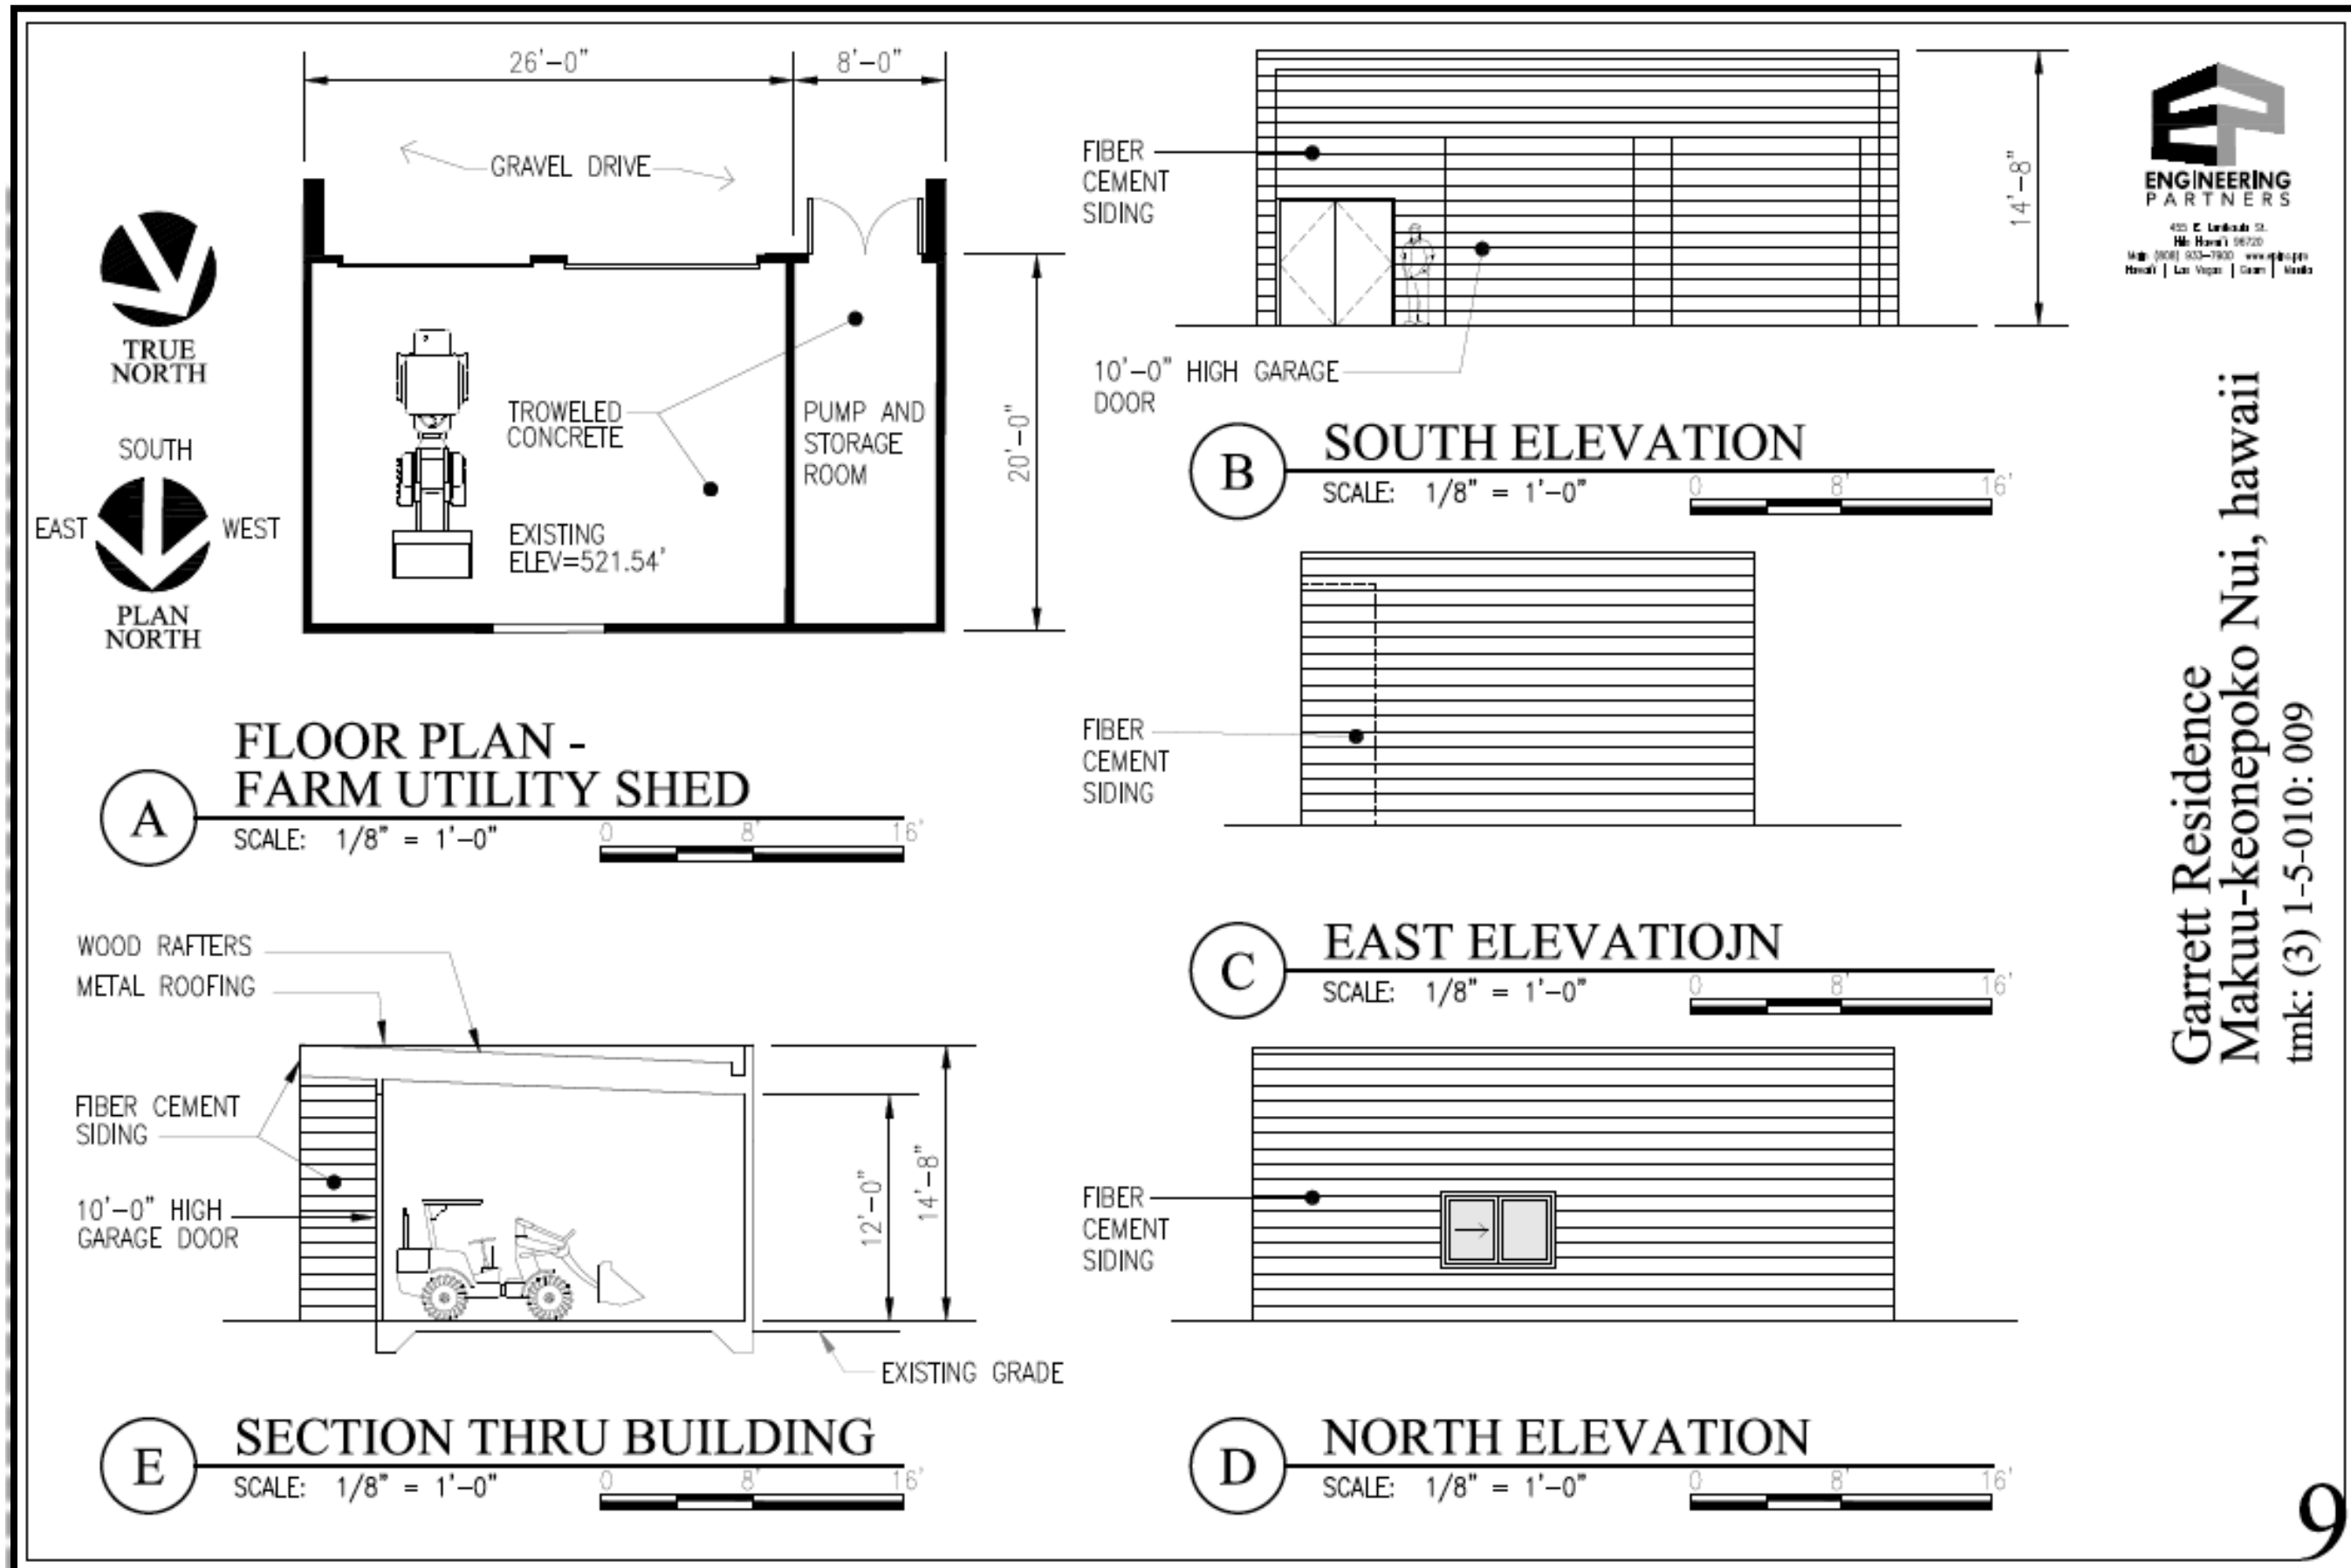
Farm/Utility Shed – Floor Plan and Elevations
